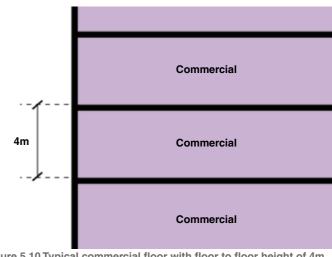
Typical commercial floor with floor to floor height of 4m
